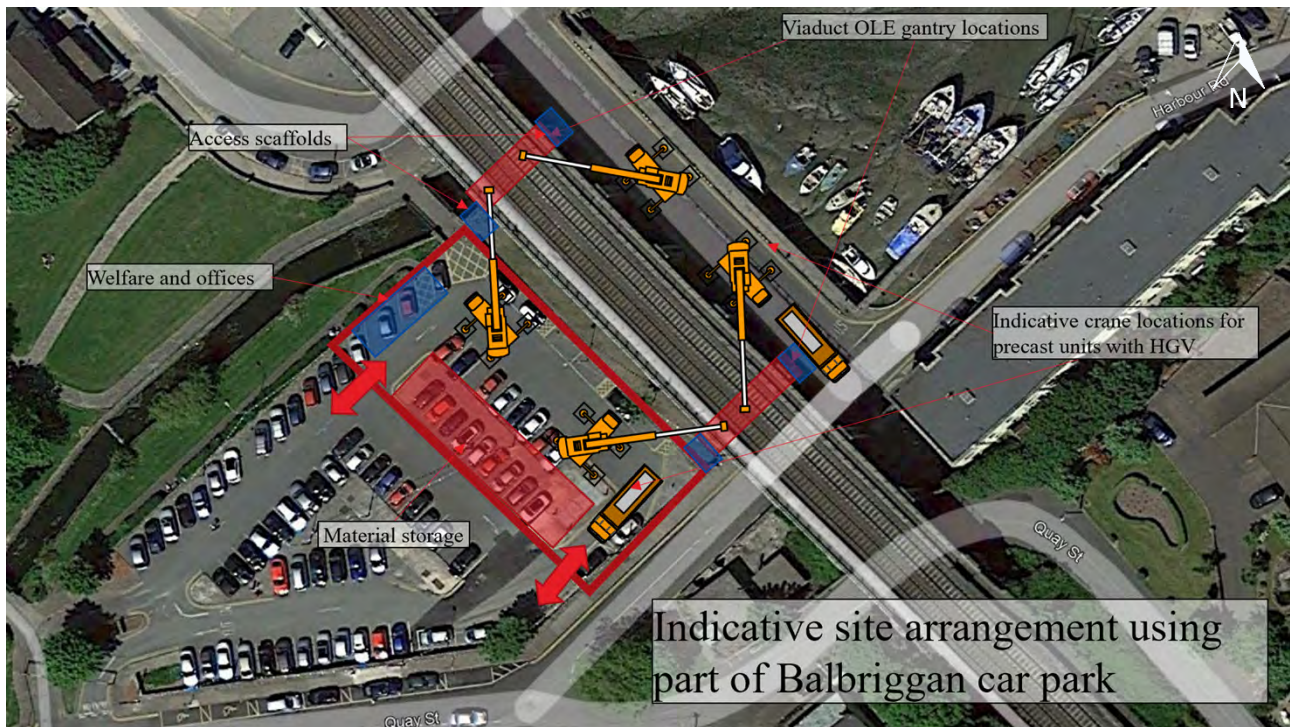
Plan of site arrangement for UBB56 gantry installation
